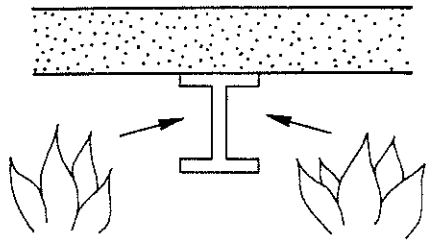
Flames penetrating between the supporting steel beams after a failure of the suspended ceiling
